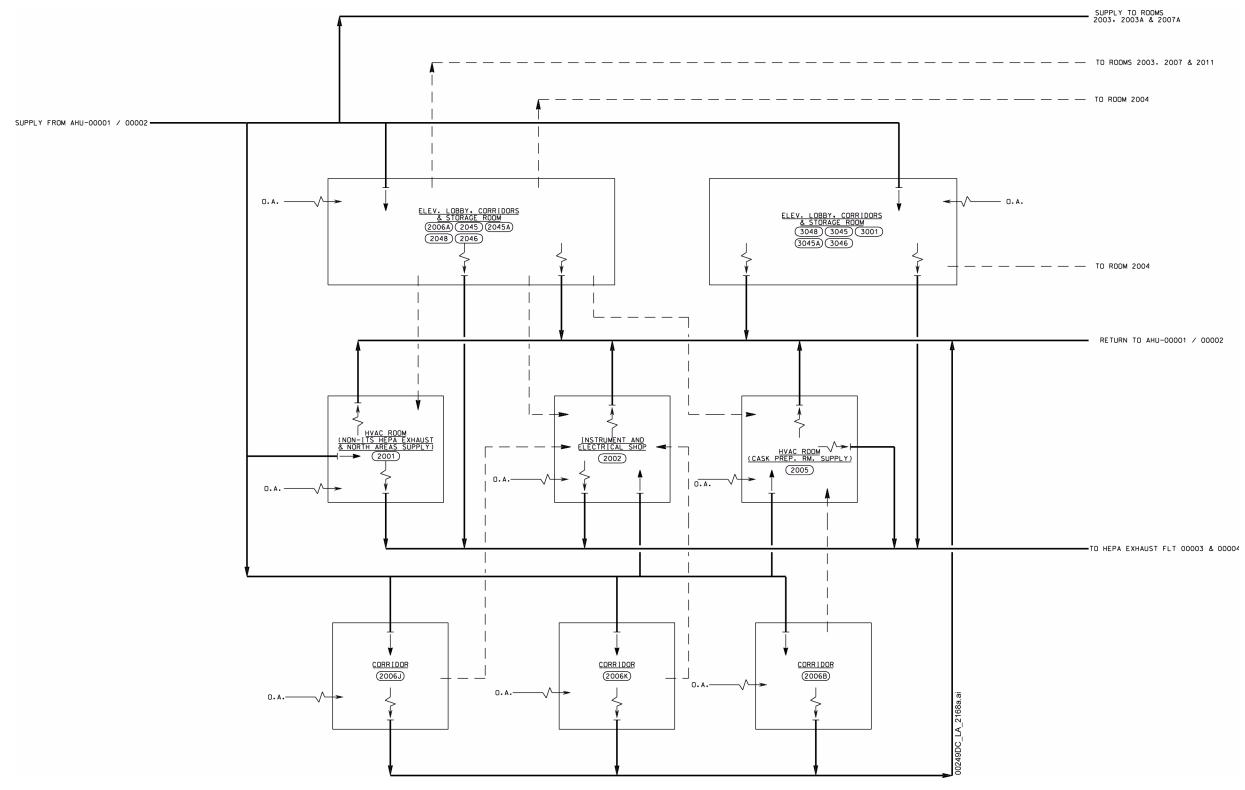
CRCF 1 Confinement Second Floor North Areas Air Distribution System Ventilation and Instrumentation Diagram
